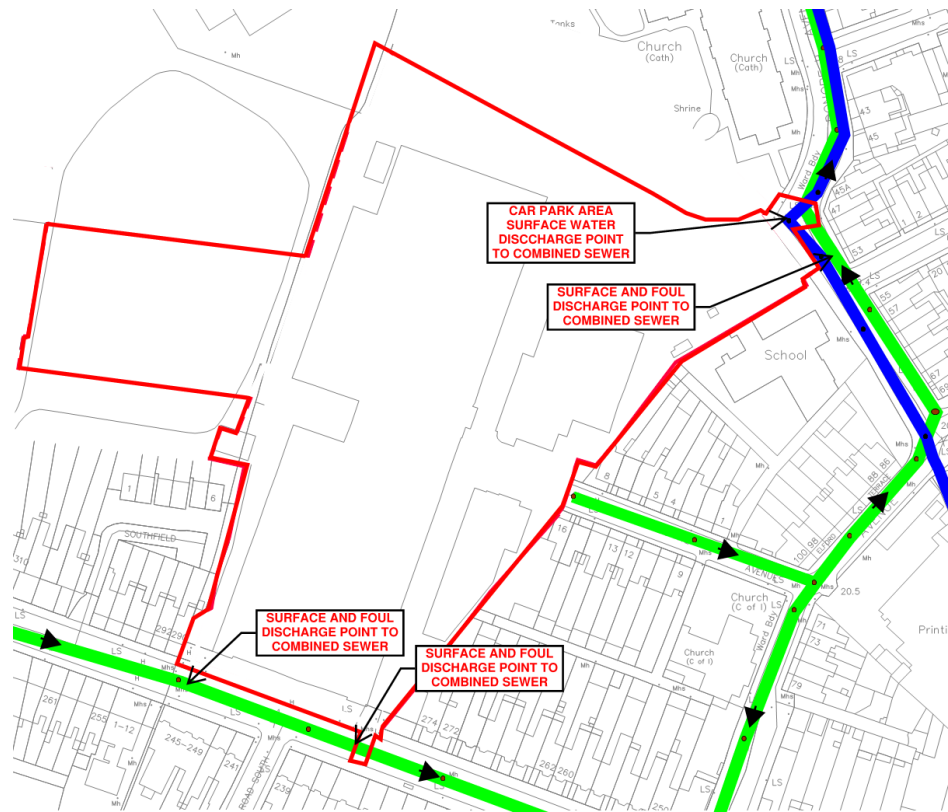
EXISTING DRAINAGE CONNECTIONS
